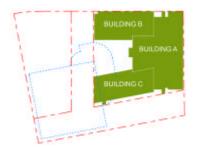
Stage 2 Indicative Project An inductive staging plan showing the demolition of the existing building and construction of Building C.
